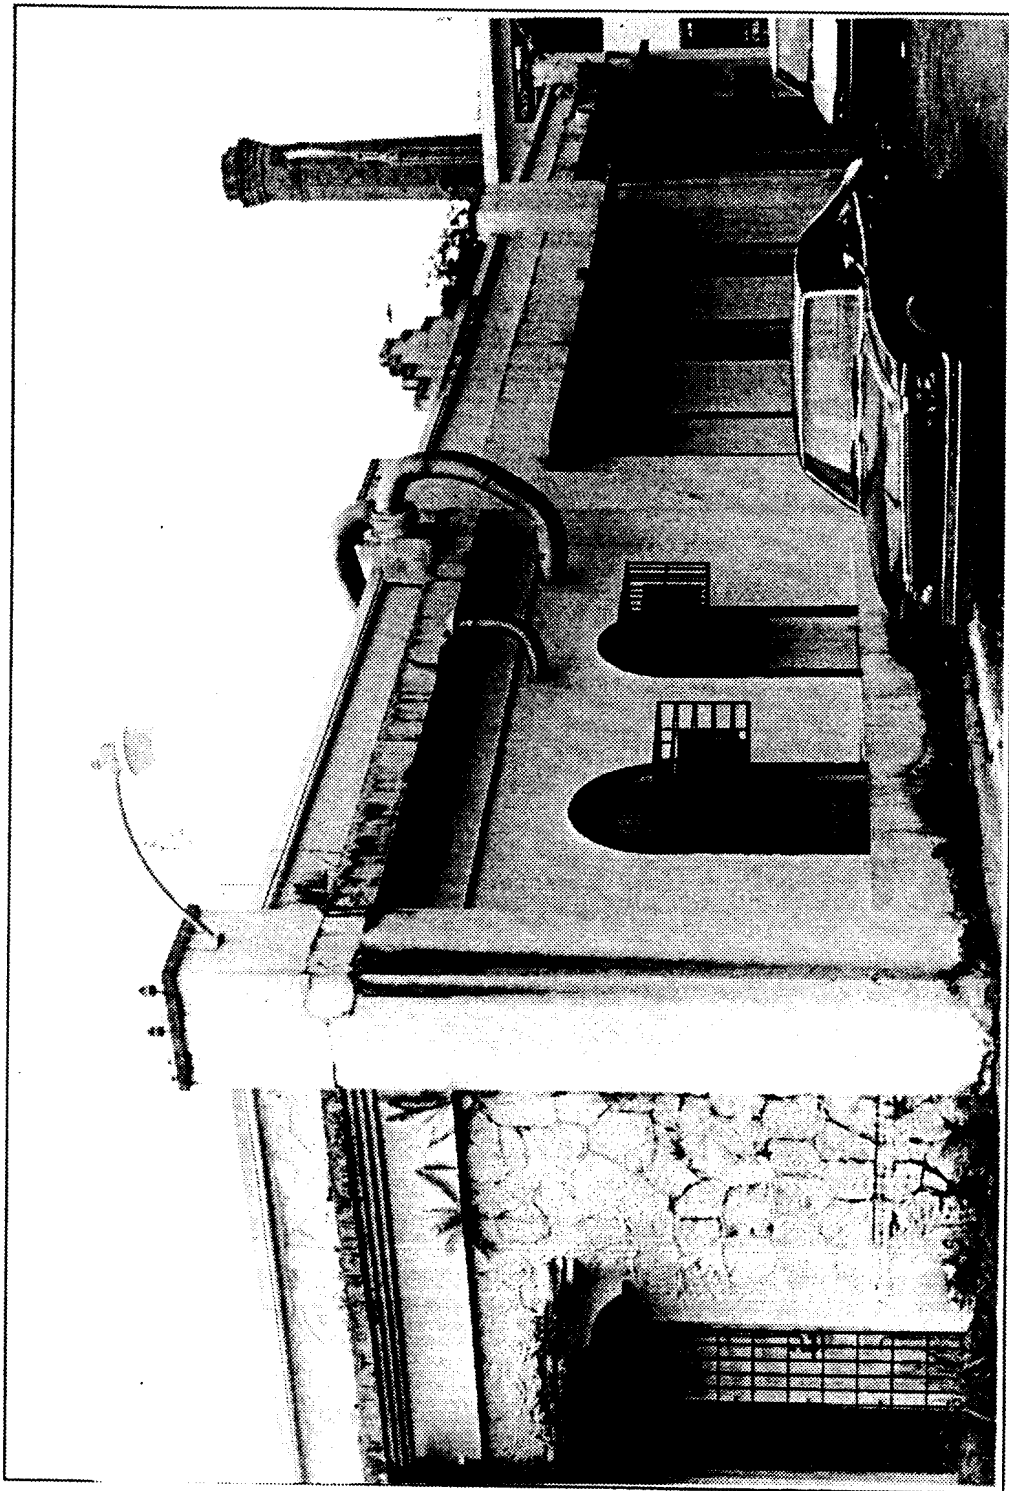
Architectural details of structure 3. Note the mortar and stone construction of the side wall and later facade. View towards the northwest.
